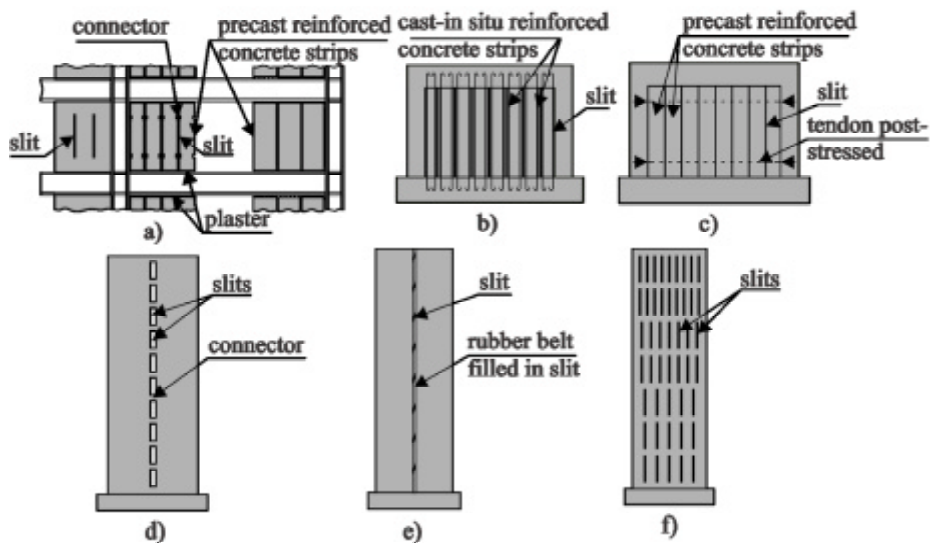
Slit panels and walls: a) precast slit panel with strips introduced in steel frames [1], b) slit panel with strips anchored in beams [2], c) precast panel with strips assembled by post-stressing [8], d) cast-in situ slit wall with a slit zone with short connections [3], e) cast-in situ slit wall with rubber belts inserted in slit zone [4] and f) cast-in situ reinforced concrete slit walls with a variable number of slits on height [6]
